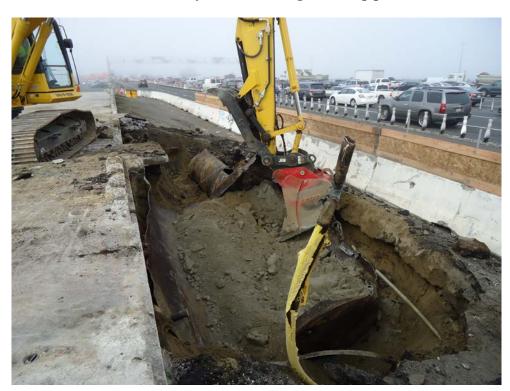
View of sand slurry in UST #3 being excavated prior to removing tank from the ground.
